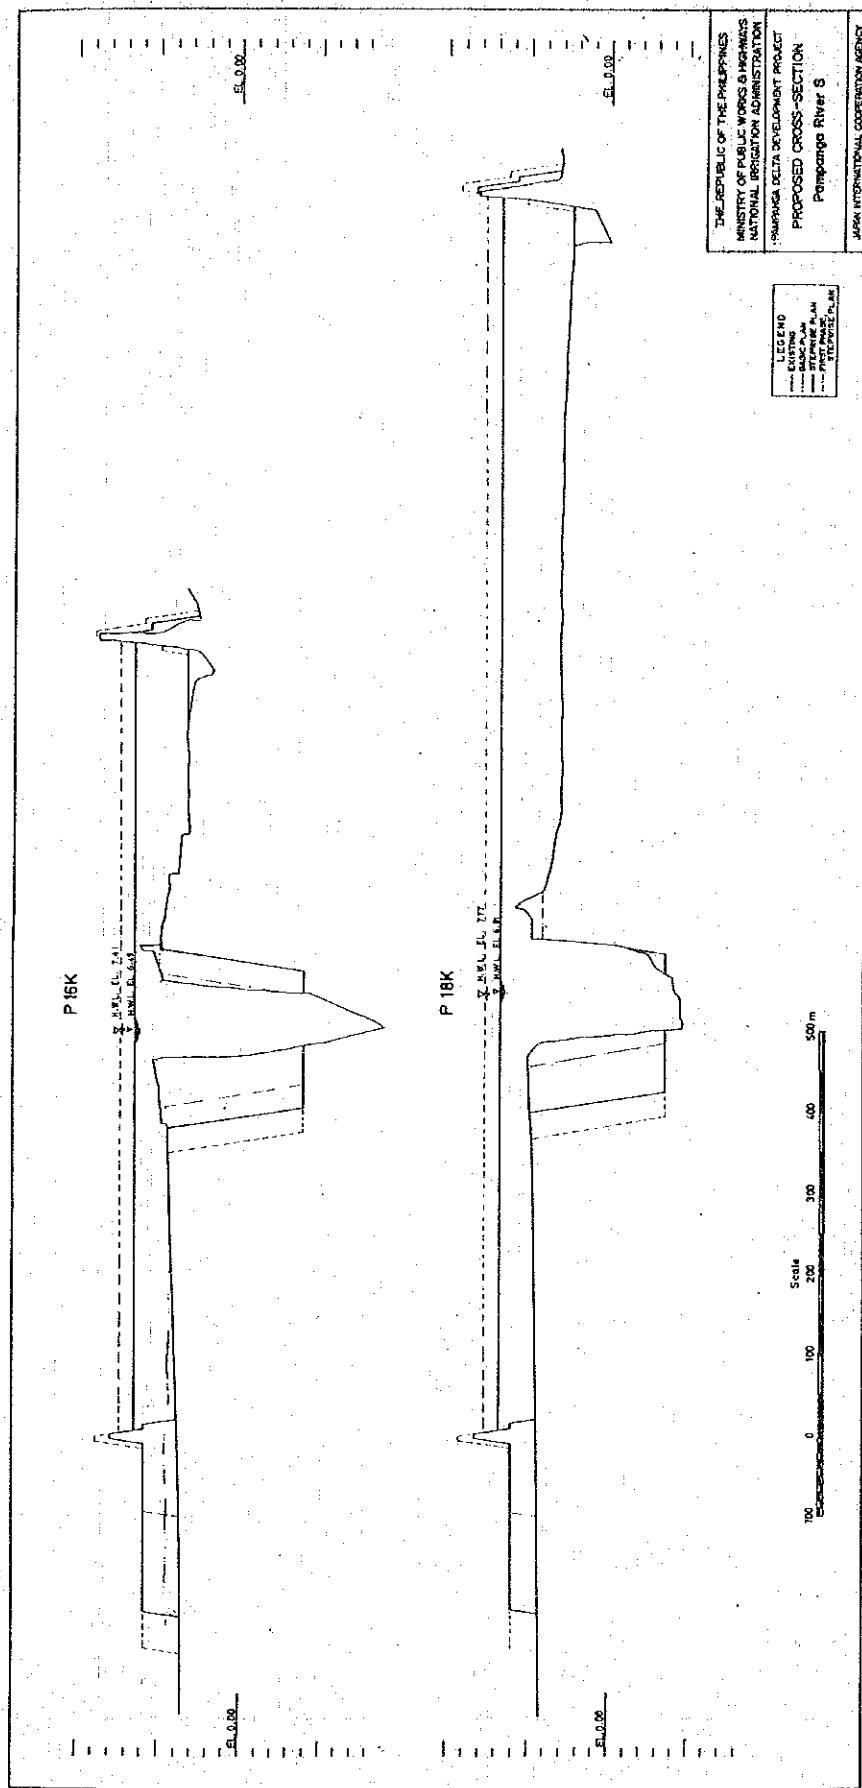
(9) PROPOSED CHANNEL CROSS-SECTION
